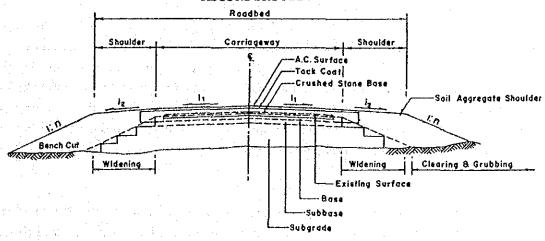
TYPICAL OVERLAY AND RECONSTRUCTION SECTIONS
